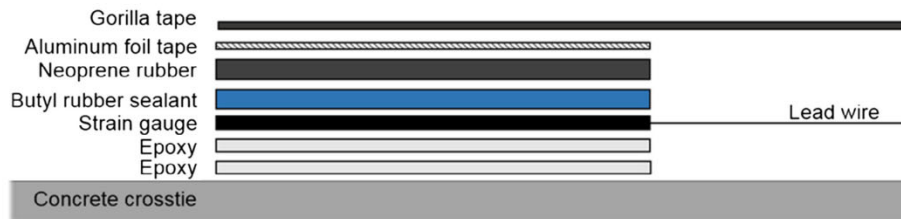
Concrete surface strain gauge protection plan modified from [36].
